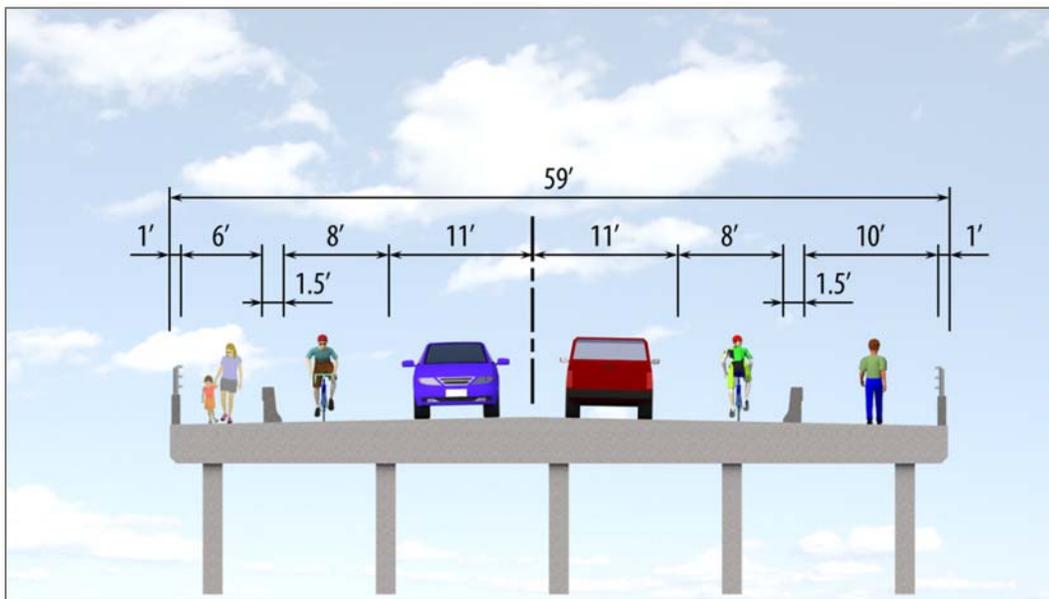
BUILD ALTERNATIVE 1 - BRIDGE TYPICAL SECTION
